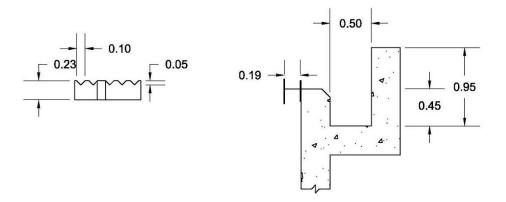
Steel and concrete detail for v-notch weir (left) and concrete outboard weir (right).
